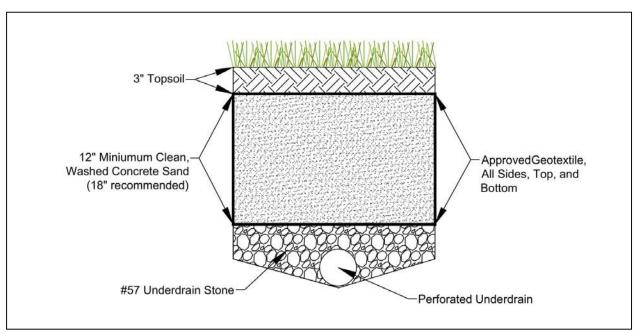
Typical schematic for a nonstructural or surface sand filter (note: material specifications are found in Table 4.44).
